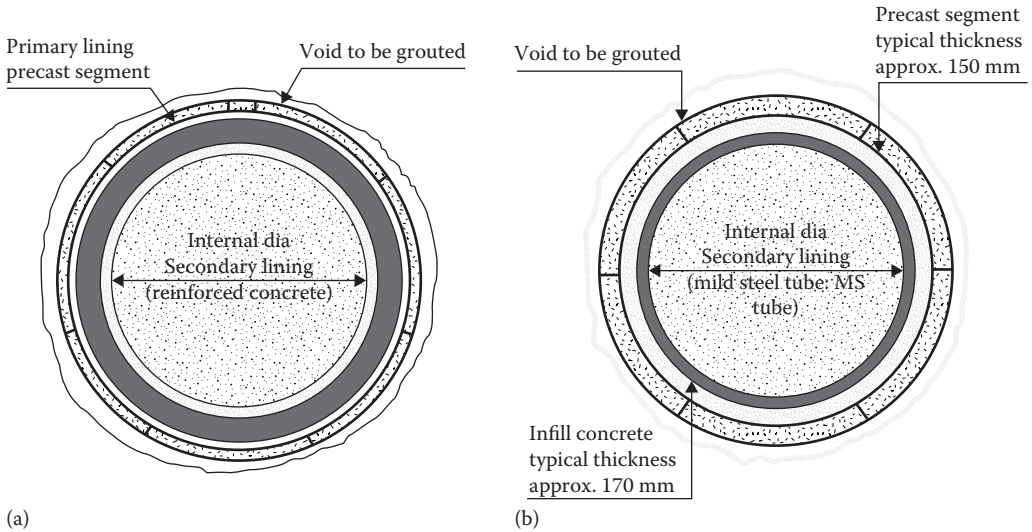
(a) Tunnels with secondary reinforced concrete lining (stage 1 phase I). (b) Tunnels with secondary steel lining which is used nowadays. (Data from Kongsomboon, T. (2012). *Tunneling and Underground Spaces in Thailand*. Bangkok, Thailand: Thailand Underground and Tunneling Group (TUTG), under The Engineering Institute of Thailand under His Majesty the King’s Patronage. With Permission.)
